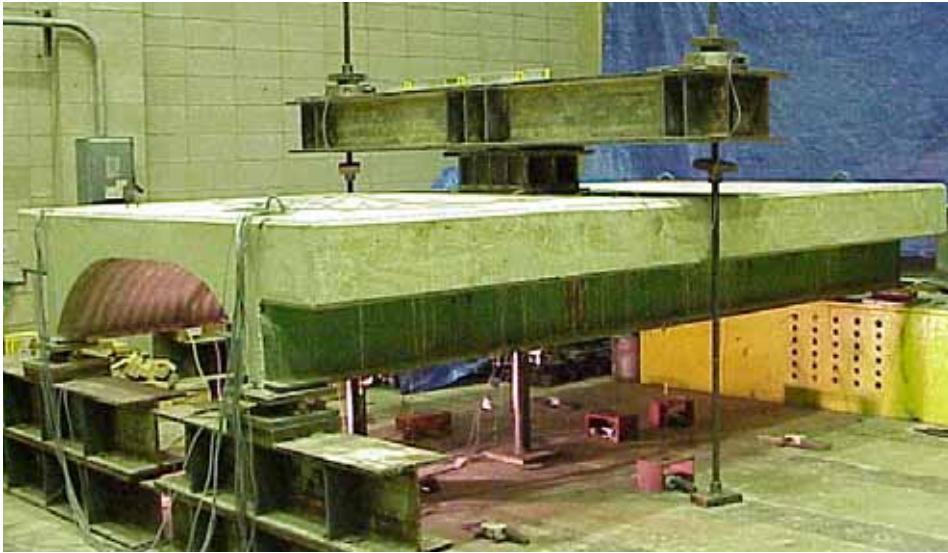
Typical setup of the ultimate punching shear test for a single bay specimen.
